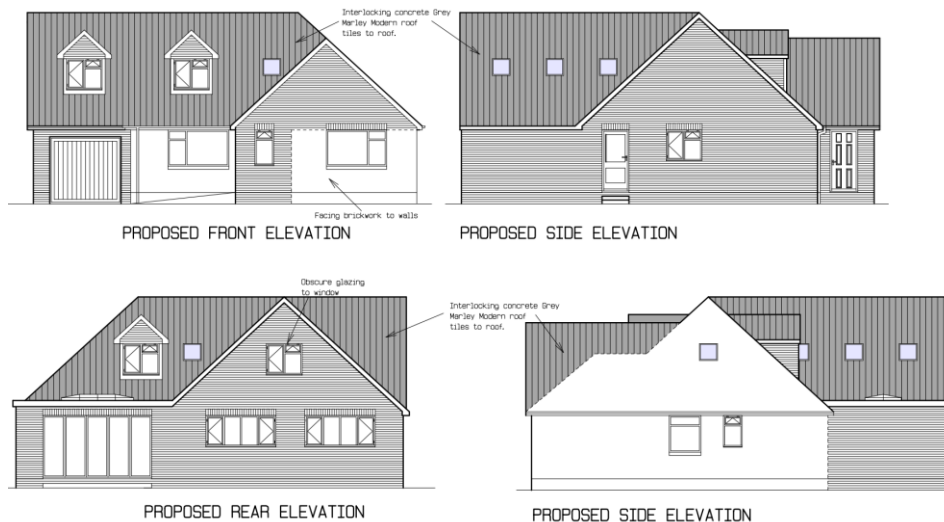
Proposed elevations under the current proposal PL/2024/00649
